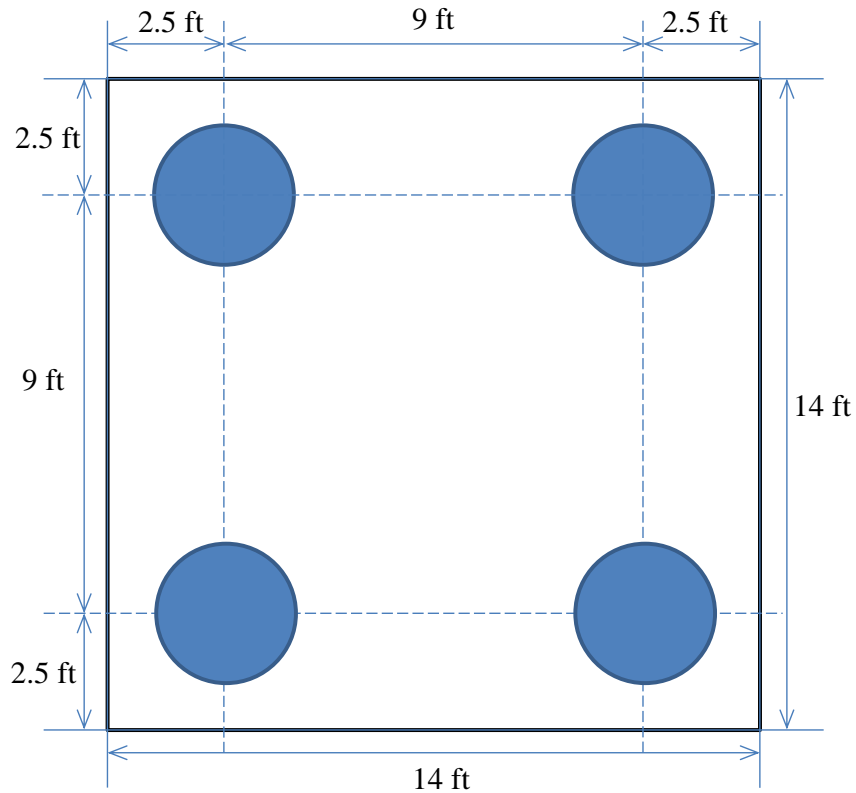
Final layout of four 110-ft long 3-ft diameter drilled shafts per cap
